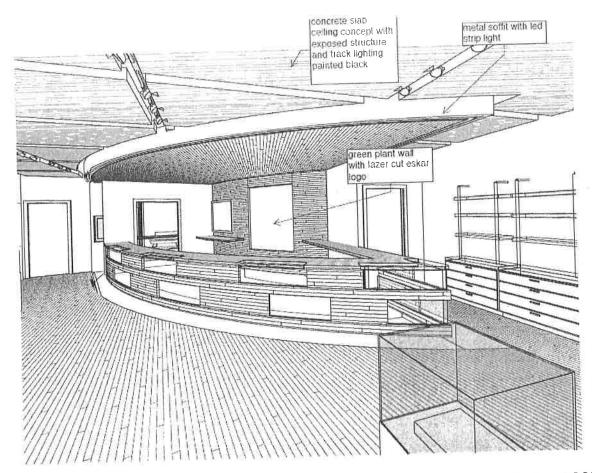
EXAMPLE OF STORE DESIGN. WOOD PANELING WILL COVER THE WALLS AND FLOOR GIVING THE STORE A MORE ORGANIC FEEL. THE CEILING WILL BE A CONCRETE SLAB DESIGN WHICH COMPLIMENTS THE WOOD PANELING.
